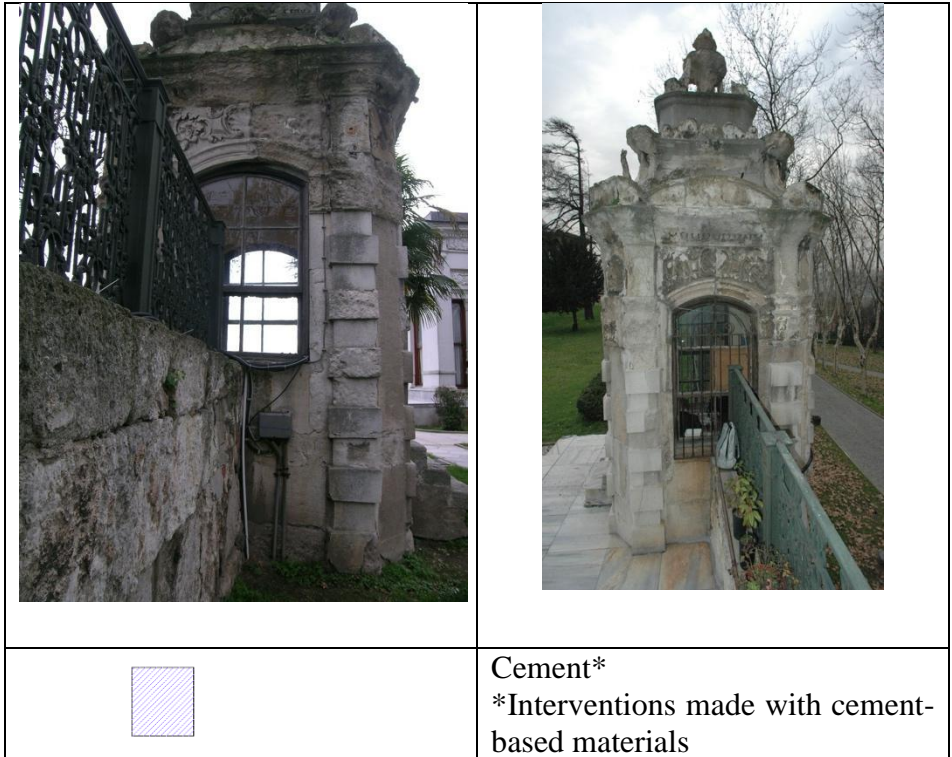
Mecidiye Gate Northeast Entrance Facade (Author Archive, Bimtaş, 2009)
